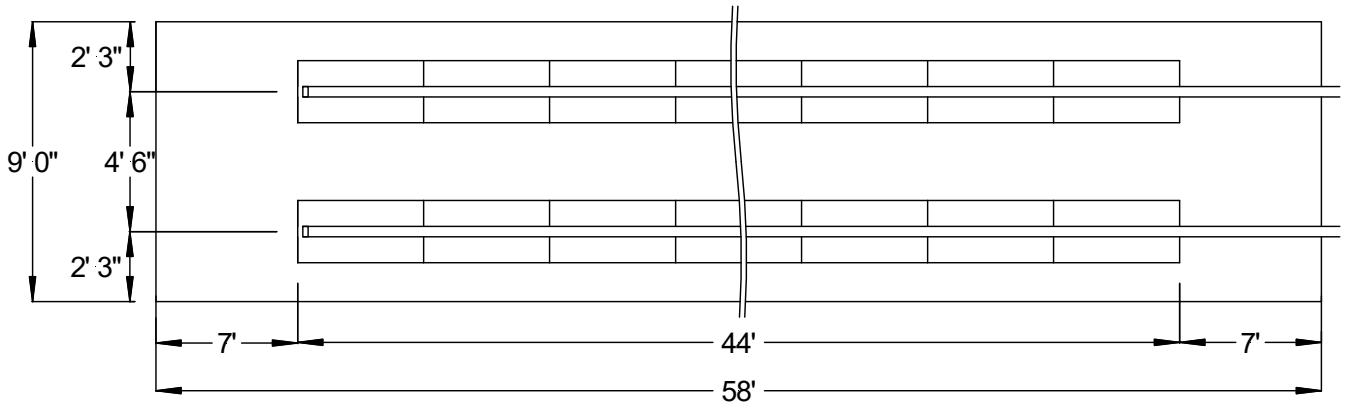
SECTION VIEW – B43 BED SYSTEM – LEVEL SITE
